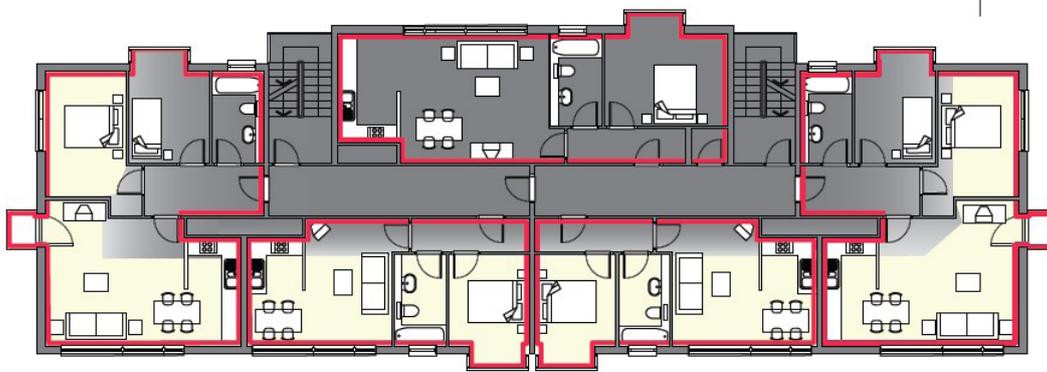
Extract from BR209:2022 Section 3 Sun-lighting: Diagram indicating sample floor plan to maximise units with a main living space facing south.
